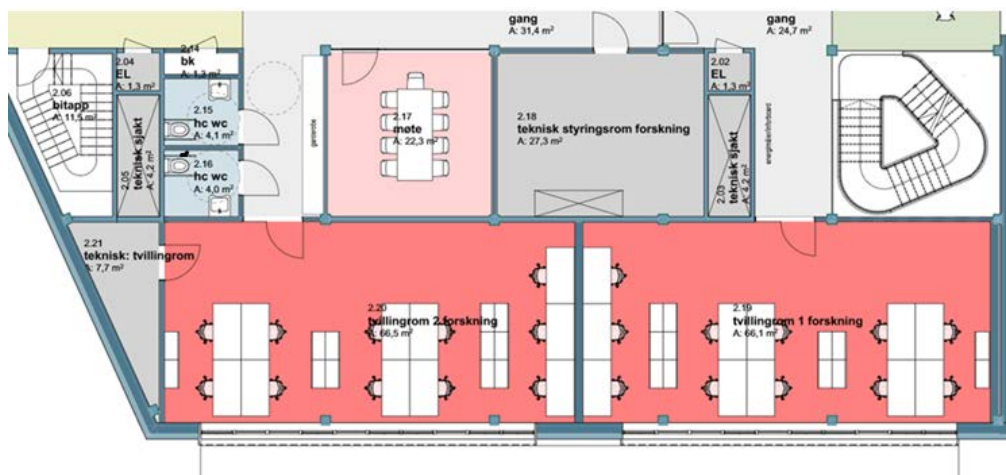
Plan for the twin rooms on the fourth floor with separate technical rooms (preliminary)
